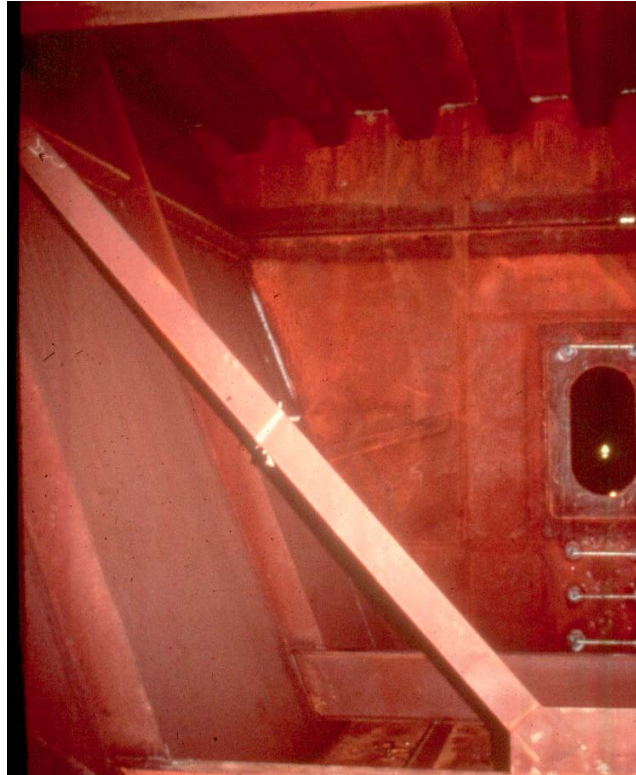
Diaphragms – K Bracing Internal Transverse Stiffeners
